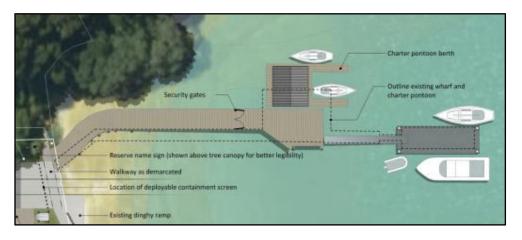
Proposed wharf facility (note existing facility denoted by pecked black line).
